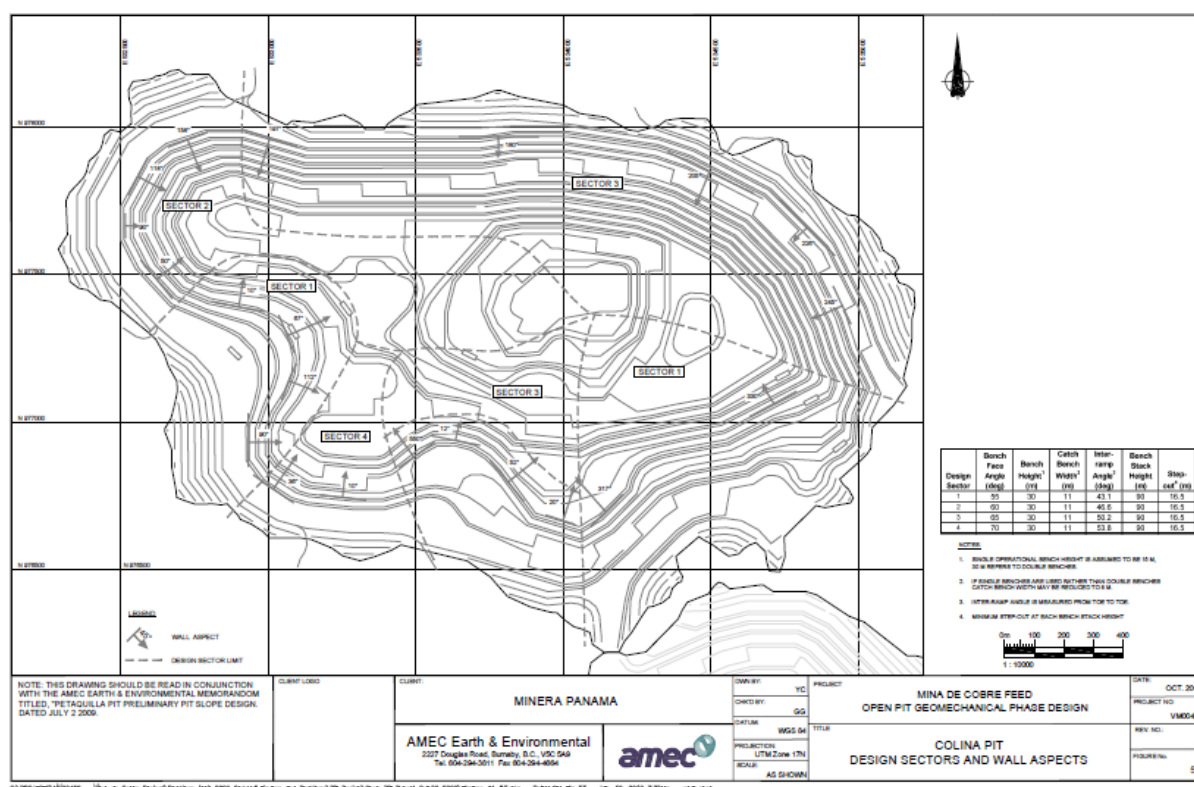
Colina Pit slope design sectors (AMEC, February 2010)
